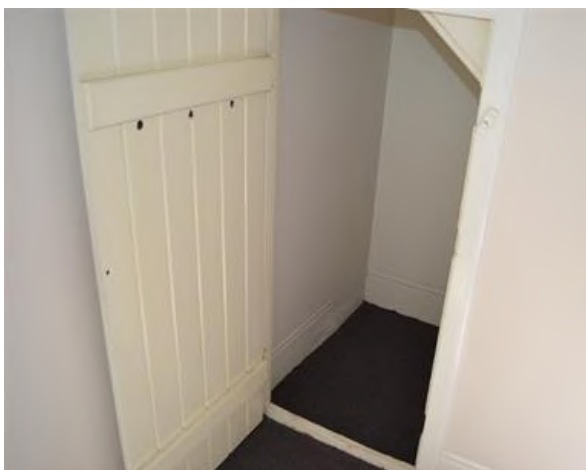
Cupboard under the stair (space 1.3) with T&G boarding and ledged timber door—46A/46–56 Gloucester Street. (Source: GML Heritage, July 2016)
